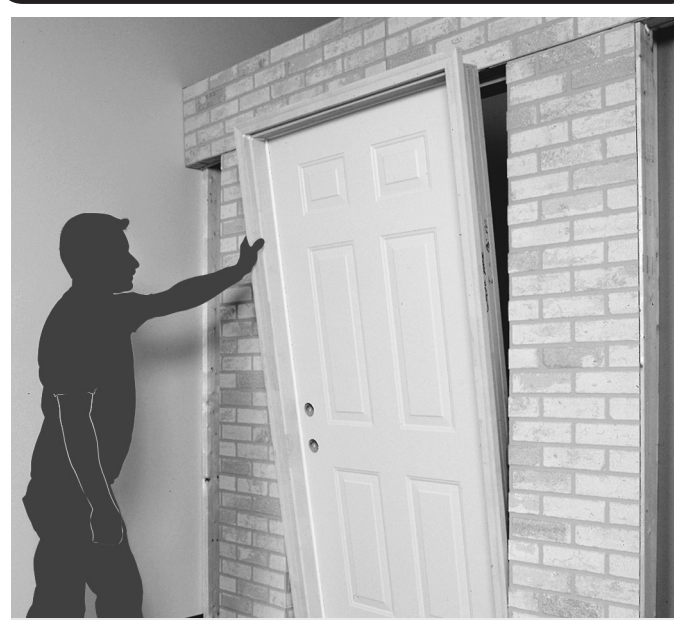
Place the sill in the opening first and then tilt the door up into the opening.
